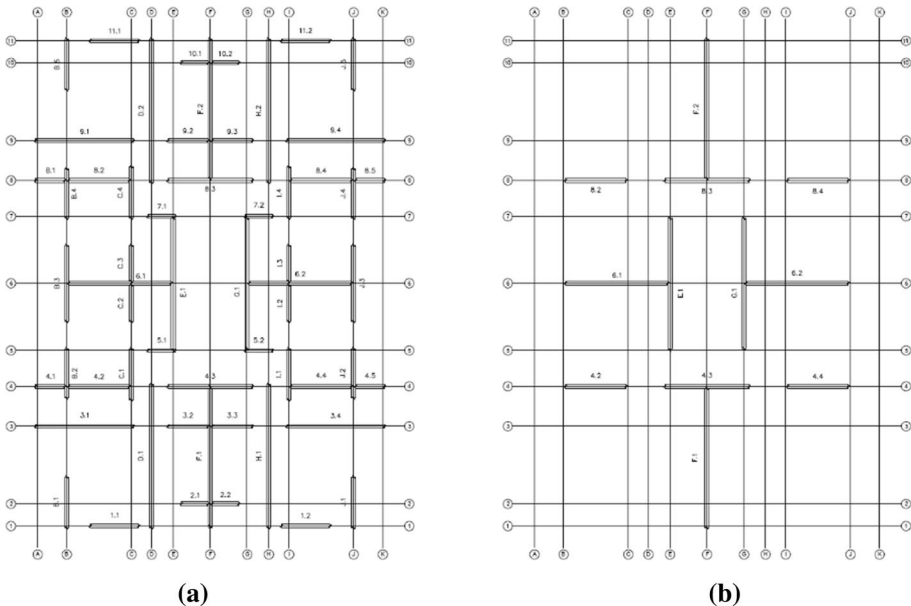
Floor plan and wall distribution of building: (a) normal frame-platform shear wall (LFTB) density distribution with total walls; (b) FPSW shear wall density distribution with some walls
